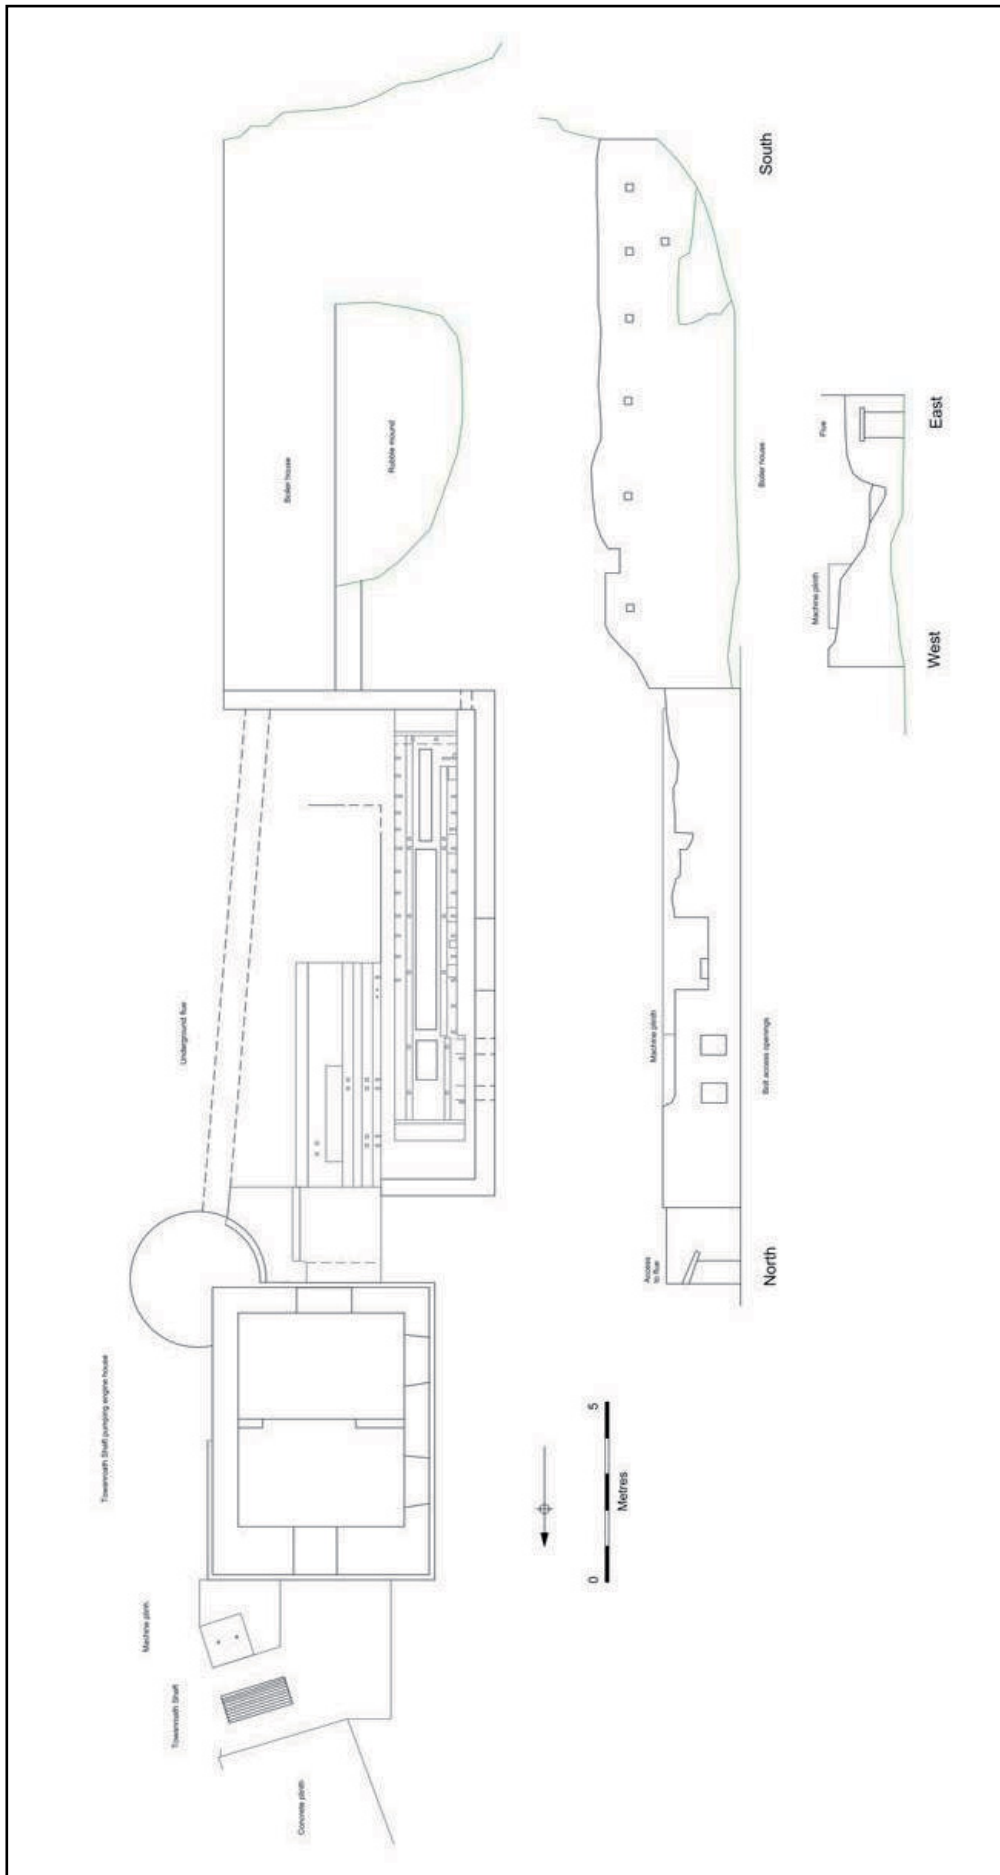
Plan of Tonanroath beam pumping engine house, horizontal pumping engine house and remains of boiler house. Western and southern elevations of horizontal pumping engine house and boiler house.
